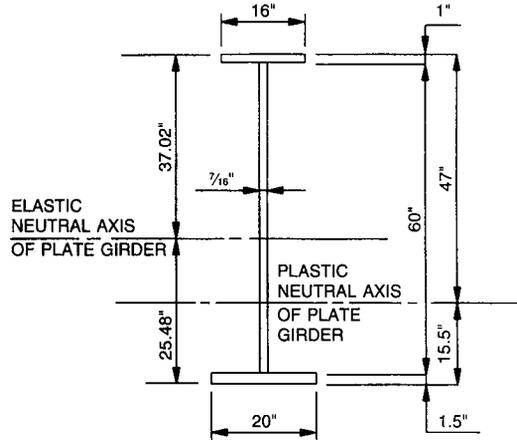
Cross section assumed for plate girder for load factor design.
